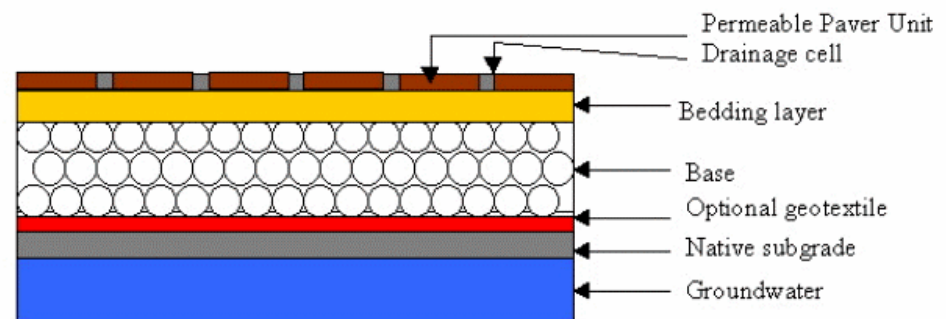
Sectional view of a permeable concrete block paving stone pavement (Gerrits, 2001).
